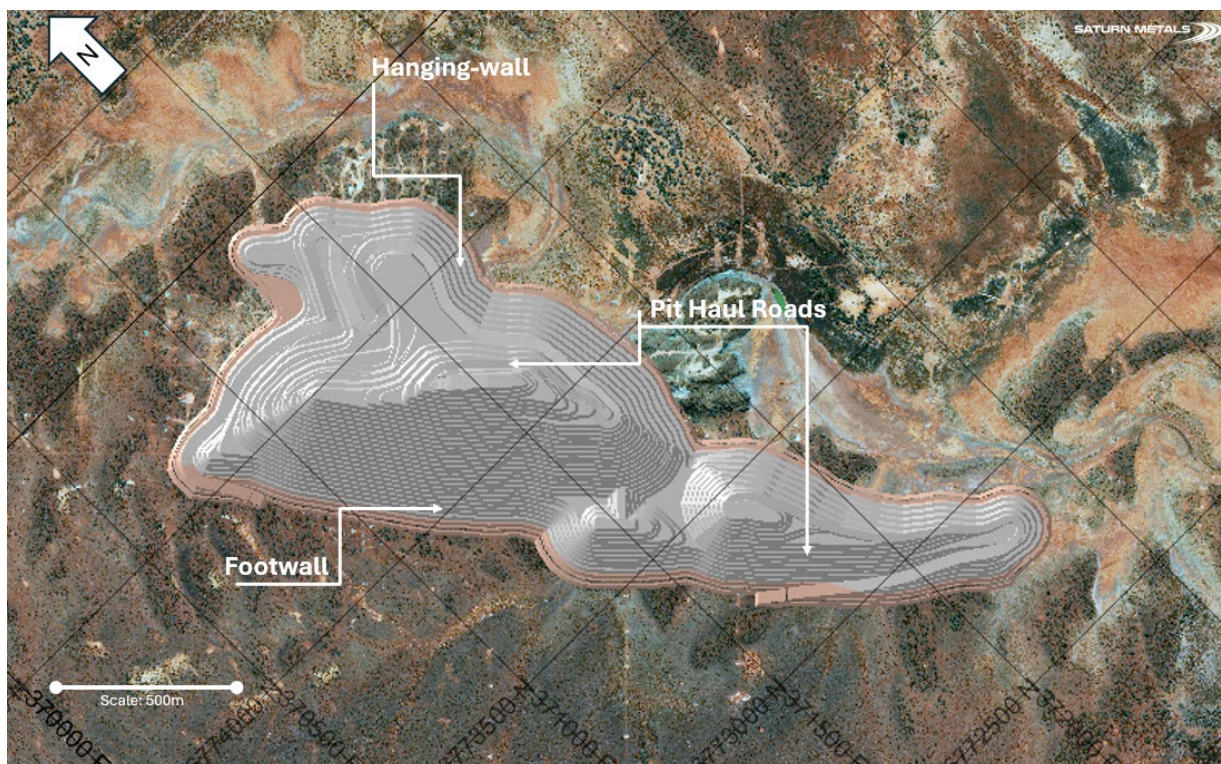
Plan View of Apollo Hill PFS Final Pit Design.
